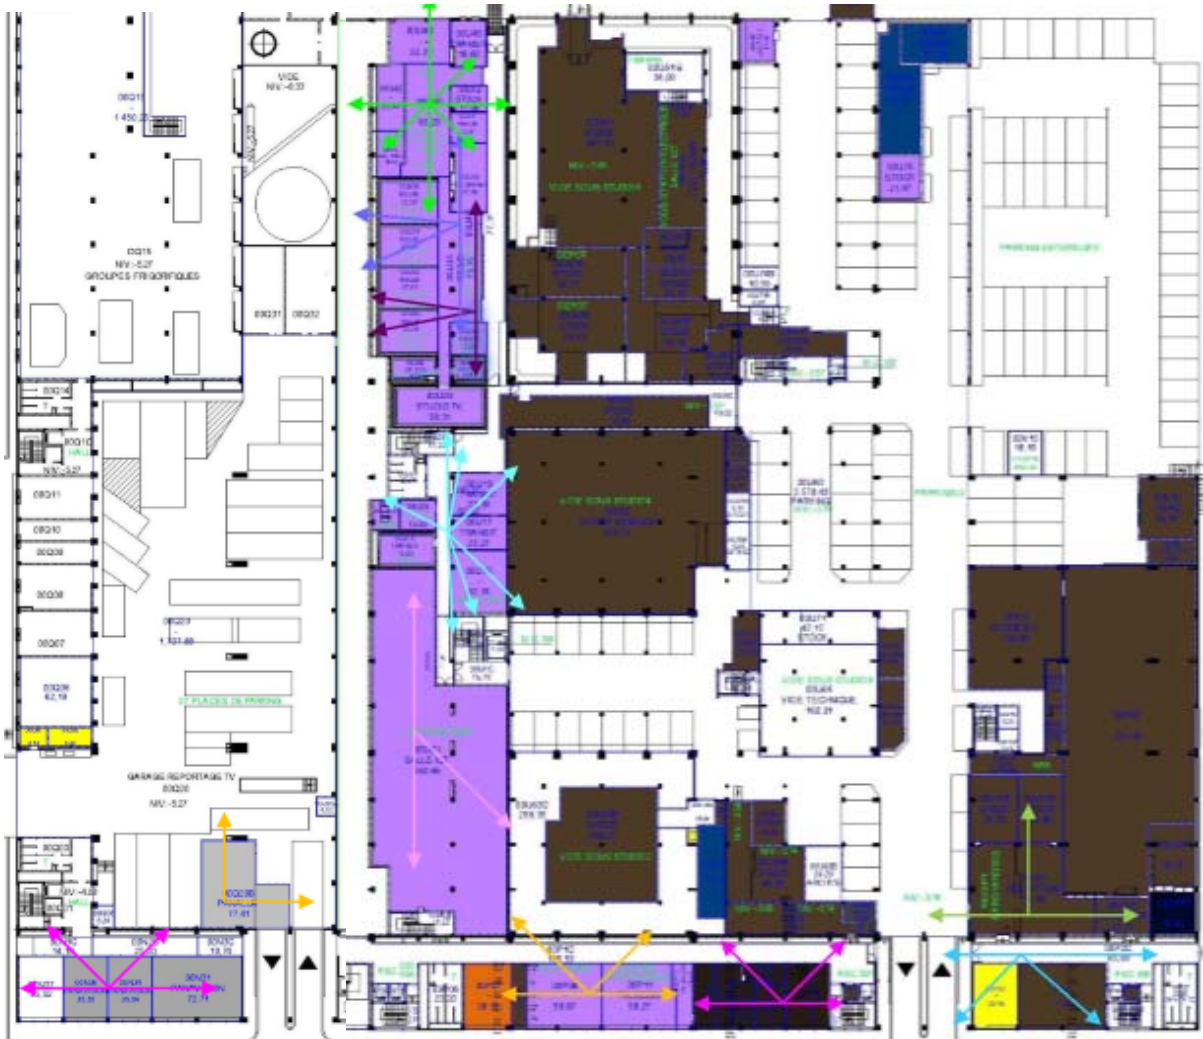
Design at 5 GHz for Ground Floor in Building CHJM
